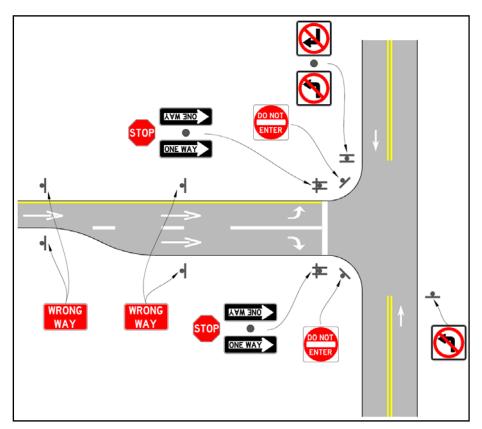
Example of signage and pavement markings at an exit ramp of a half-diamond interchange.
